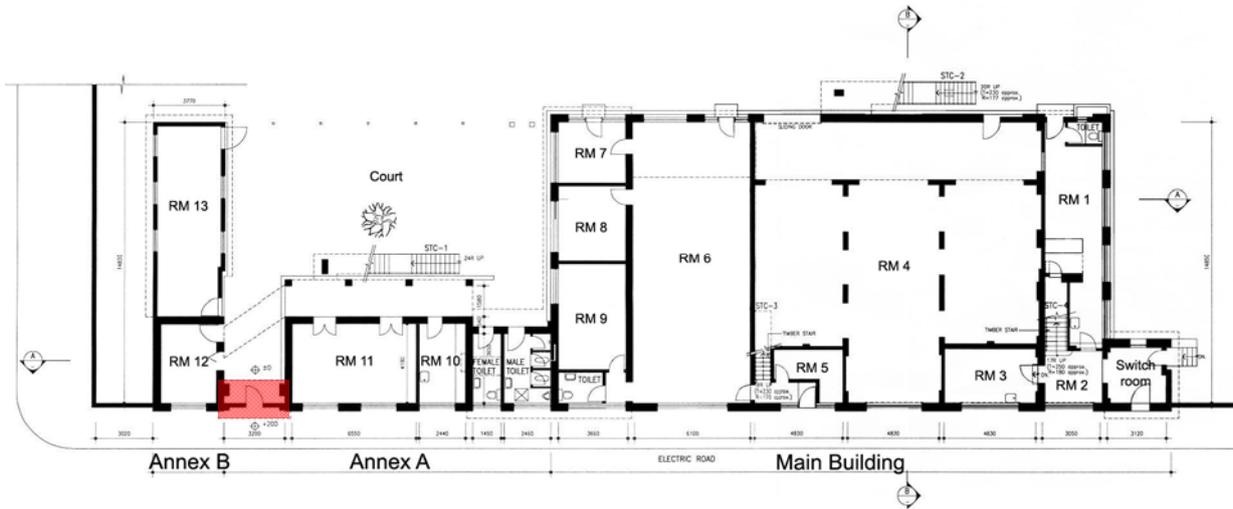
Location of the former entrance gate on the ground floor at the former clubhouse (1:400).
